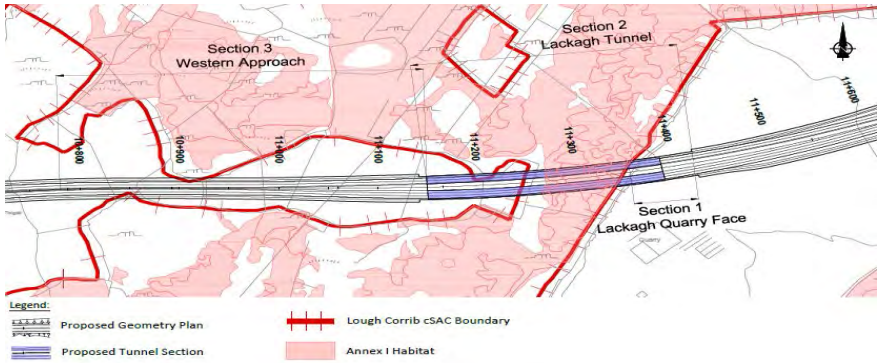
(b) - Plan overview of Lackagh Tunnel (Section 2)
